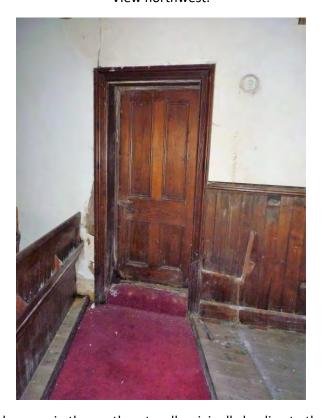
Blocked doorway in the southeast wall, originally leading to the adjacent building.
